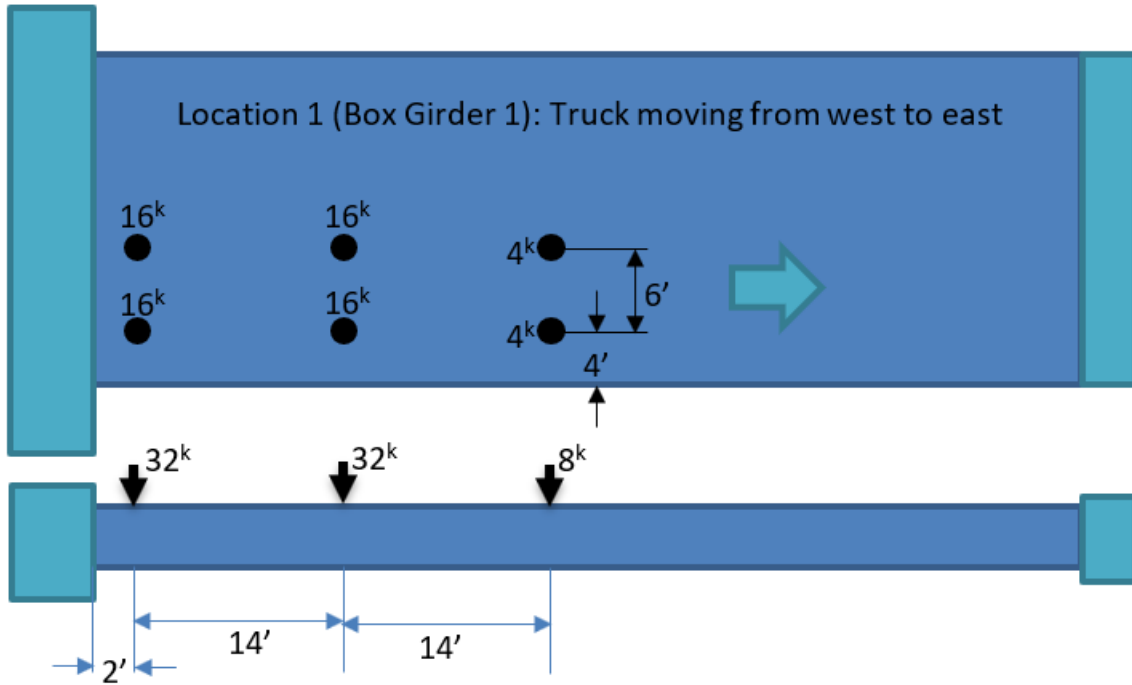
Distance of live load from edges and magnitude of live load at Location 1 (box girder Span 1); truck moving from west to east
